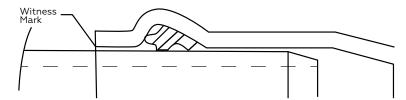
Rieber rubber ring joint is supplied pre-installed in pipe socket.
